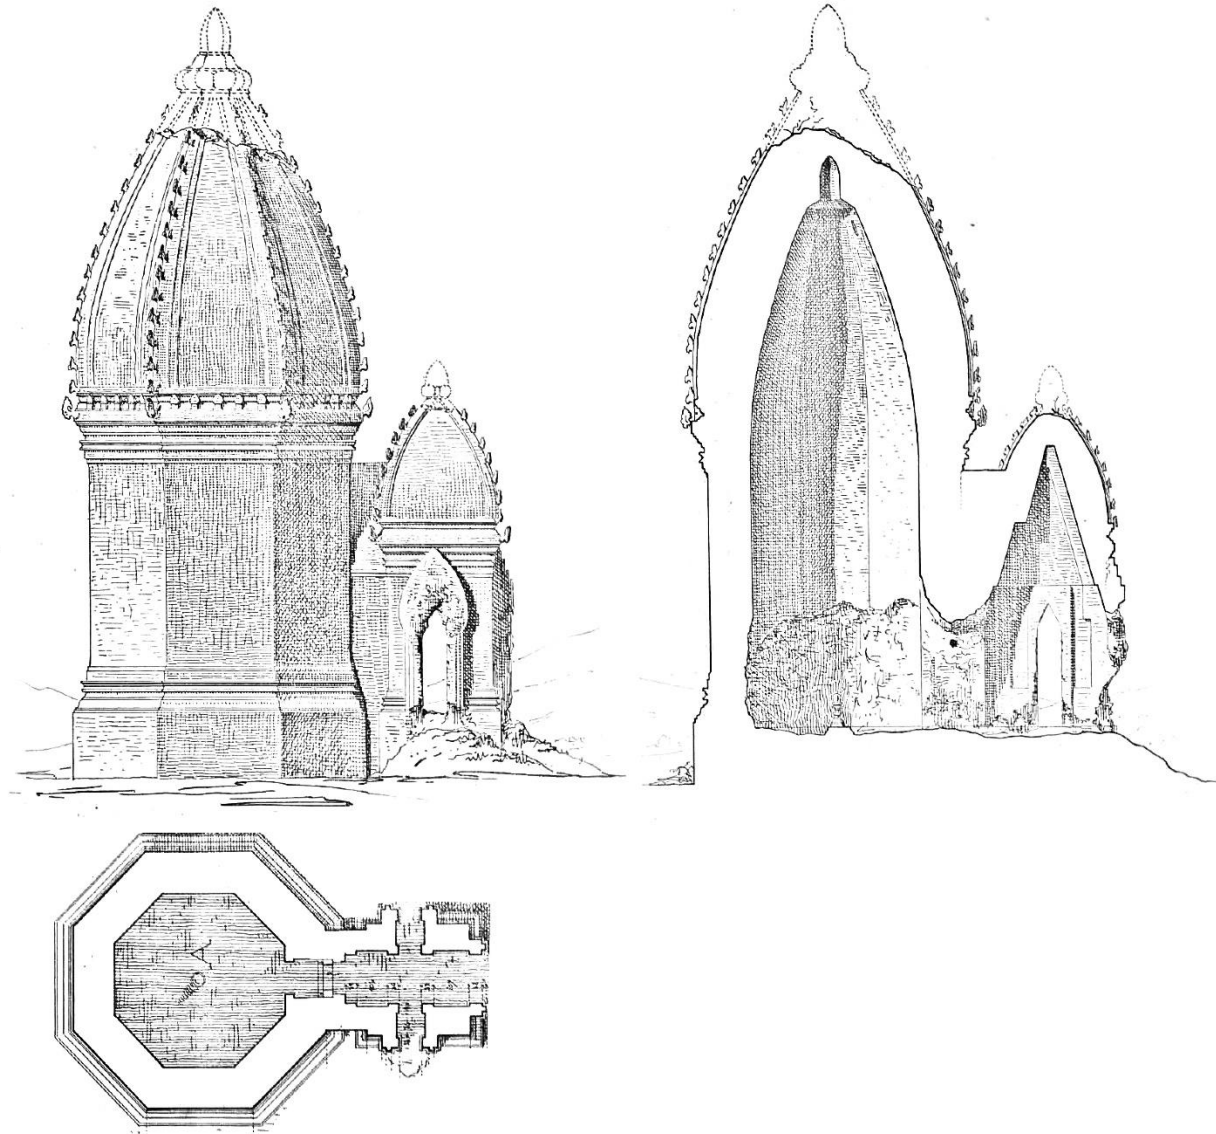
27: The plan of Bàng An main temple-tower. Source: (Parmentier 19109: planche LXV-LXVI)
